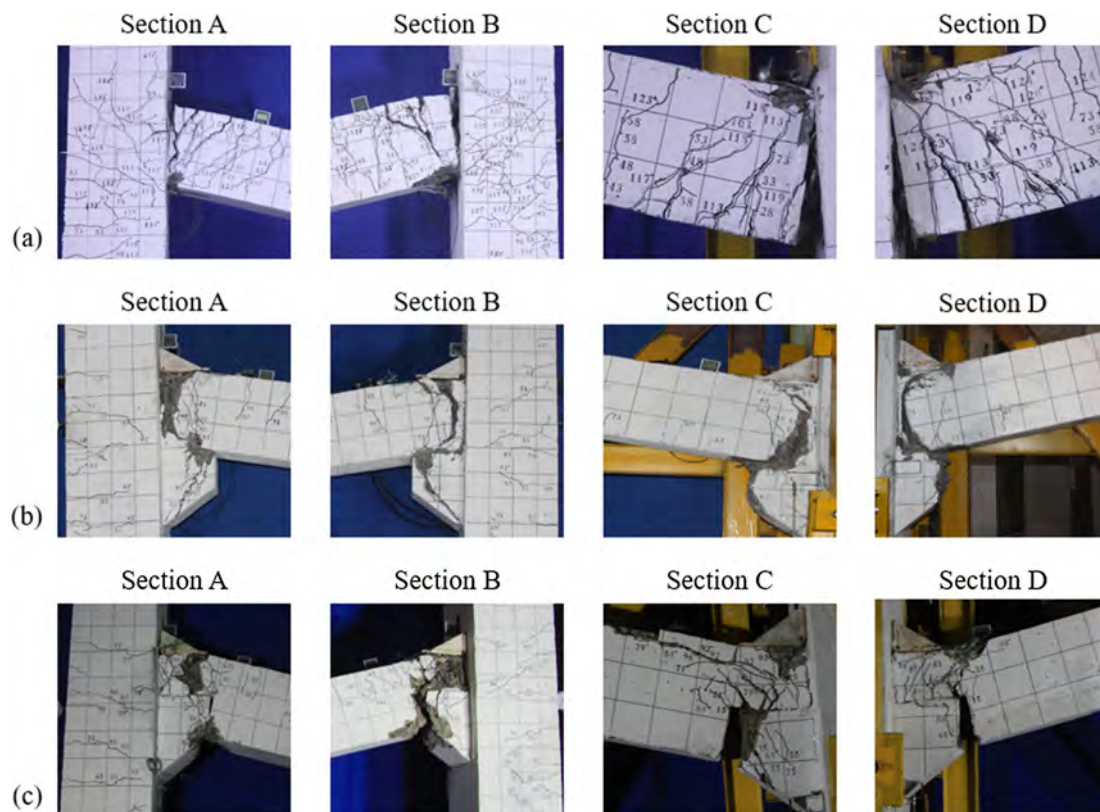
Damage patterns of specimens: (a) specimen RC; (b) specimen PC1; (c) specimen PC2 (Section A denotes the left exterior joint, Section B denotes the right exterior joint, Section C denotes the left side of interior joint, and Section D denotes the right side of interior joint).
